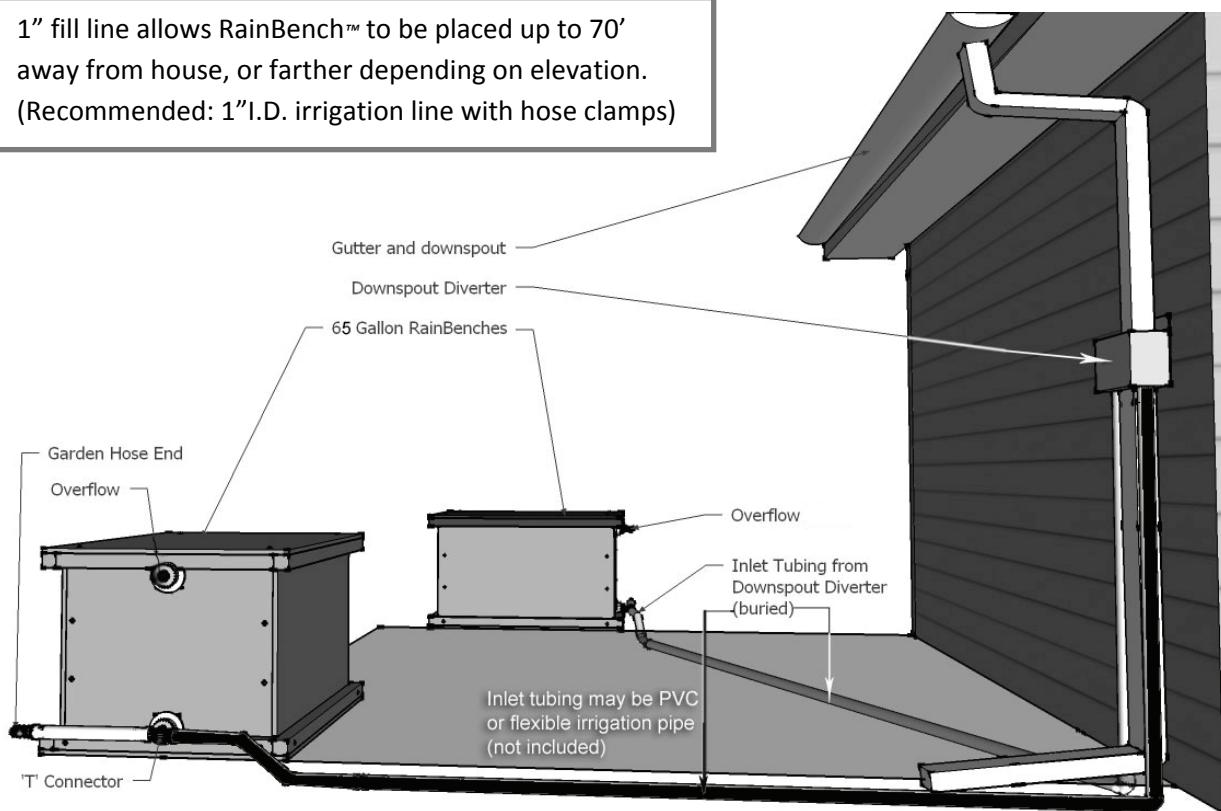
Diagram of standard hookup using downspout from house and 2-outlet diverter. Diverter should be mounted just above top of highest RainBench™ in order to fill to capacity. Overflow can be further directed with tubing equal to or larger than inlet tubing.
